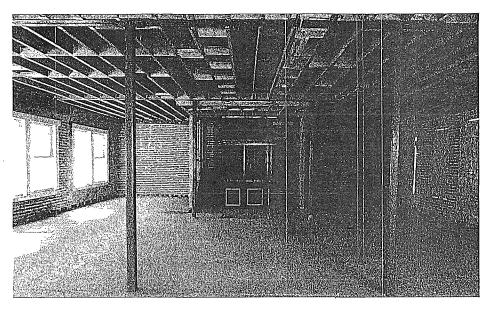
Photograph of typical south interior elevation. (photograph taken on 02/27/2018).
